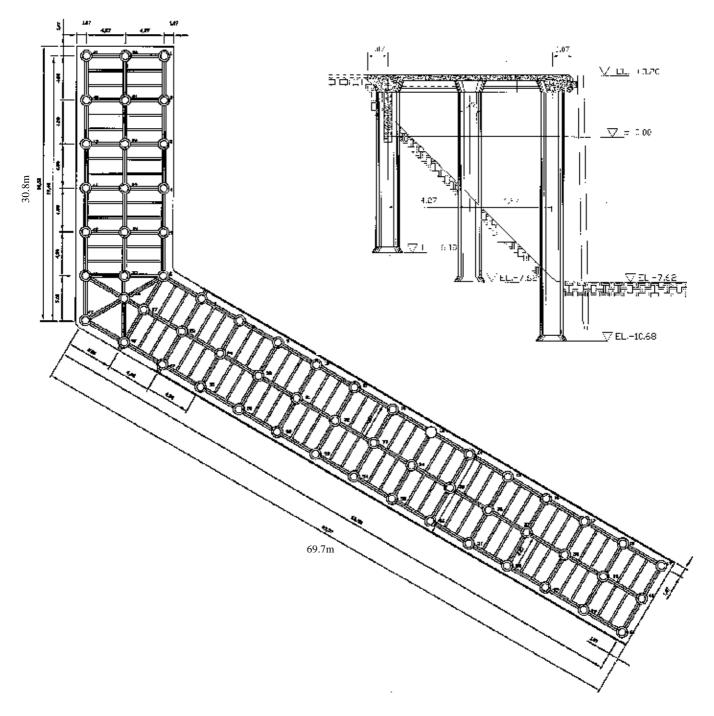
Typical plan and section of Existing Quay Structure
